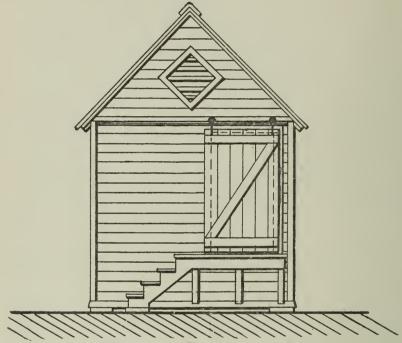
Combined Ice House and Milk Stand. Front Elevation.
